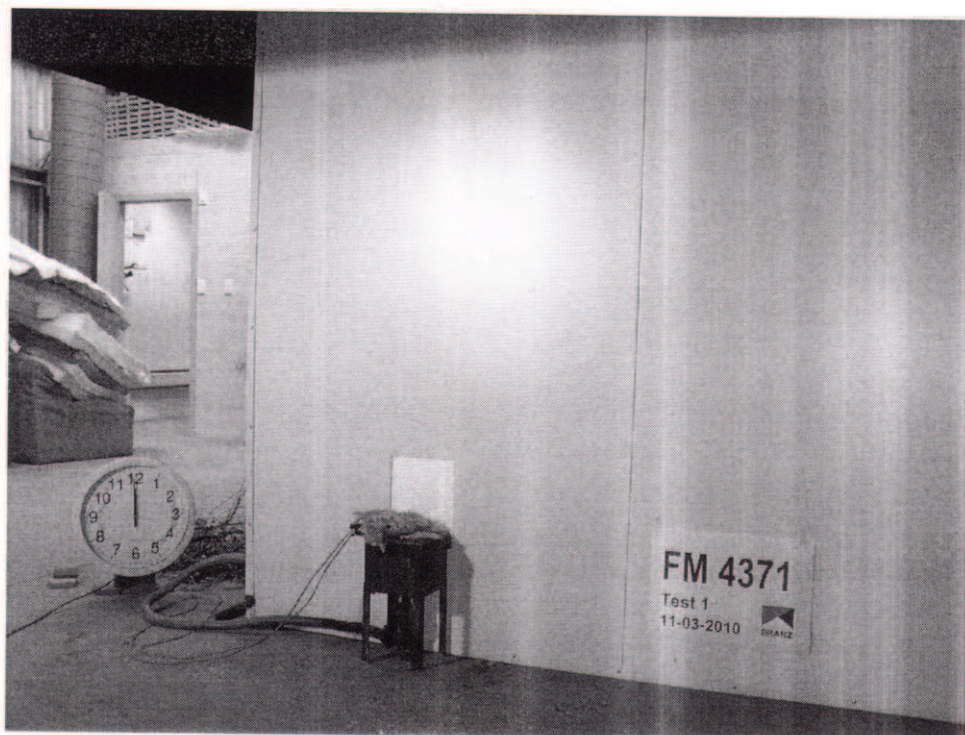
Wall test 1 – start. (same set-up as for Wall test 2)
